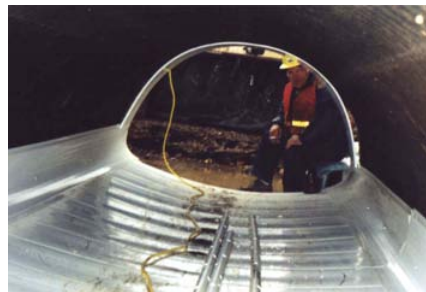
Arch PVC panels complete the slipforming (Danby Pipe Renovation, 2007)
